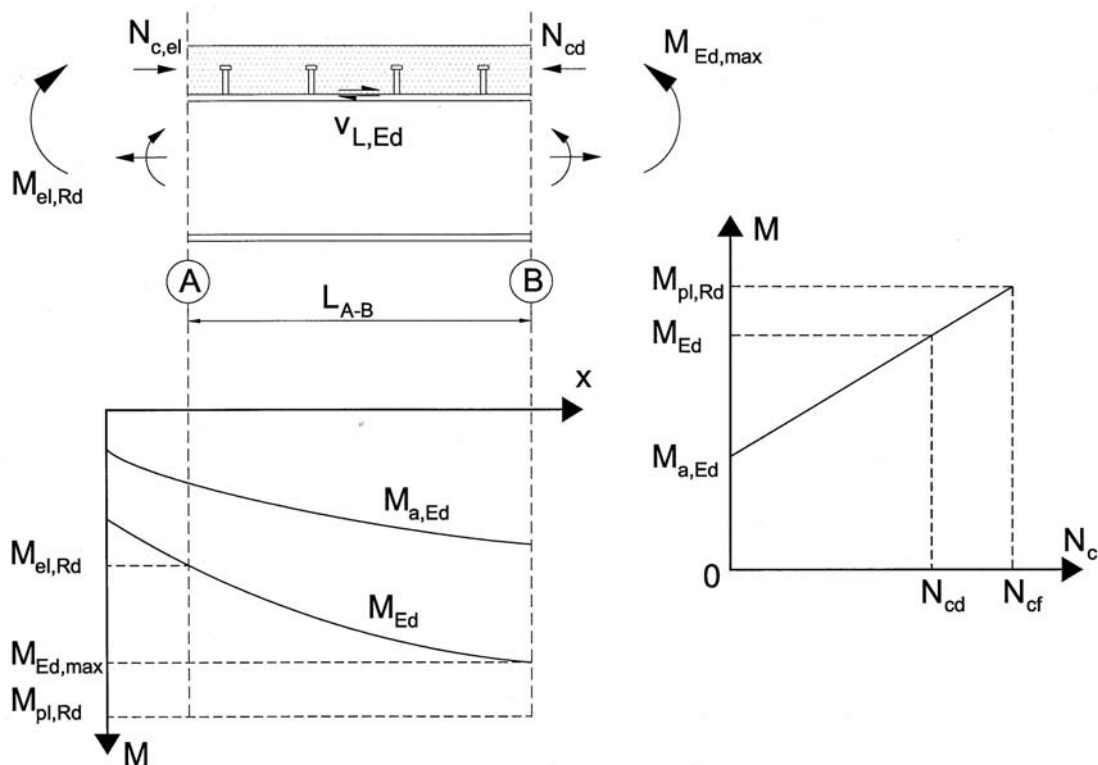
Longitudinal shear in beams with cross sections in Class 1 or 2, concrete flanges in compression and inelastic behaviour of cross sections
